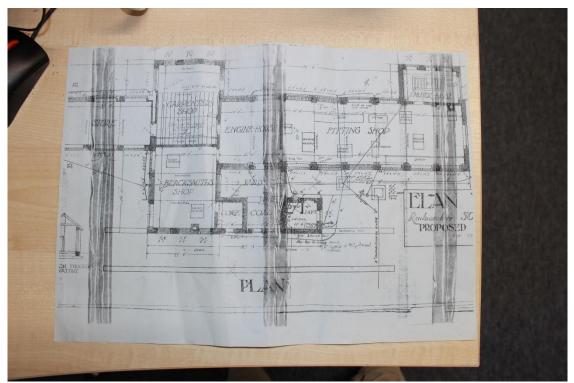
Original copy of the proposed building plan for the workshop that became the Visitor Centre building.
